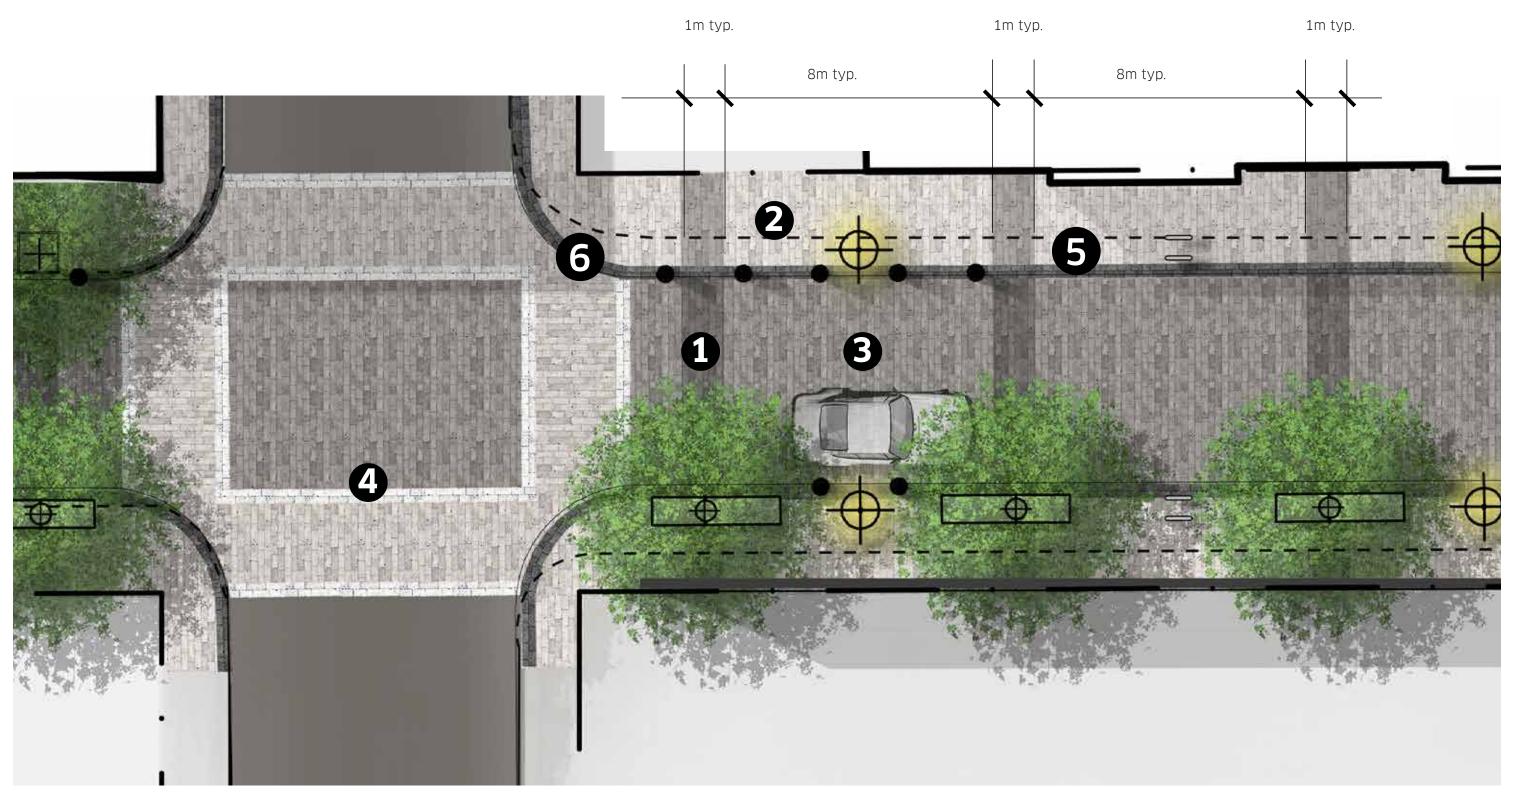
PAVING DEMONSTRATION PLAN AT HUGHSON STREET.
